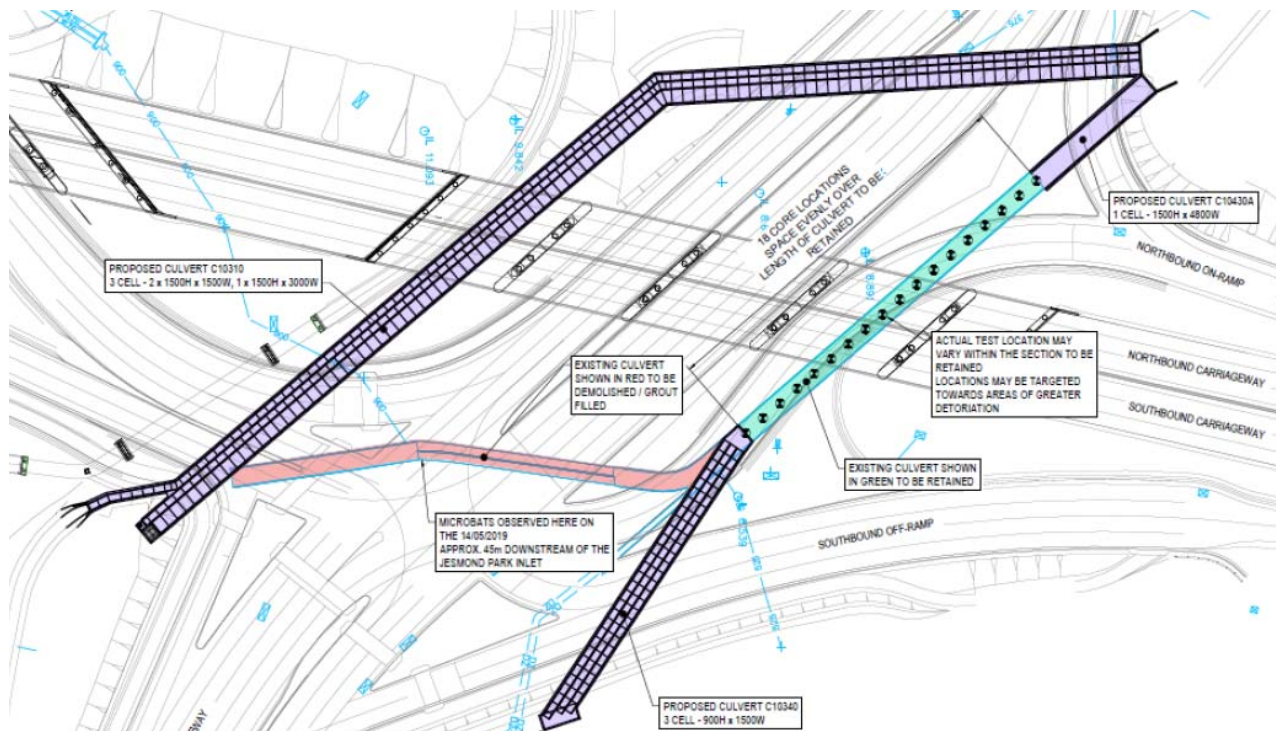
Existing culvert to be removed (pink), culvert under NCIB to be retained (cyan) and new box culverts (purple)
